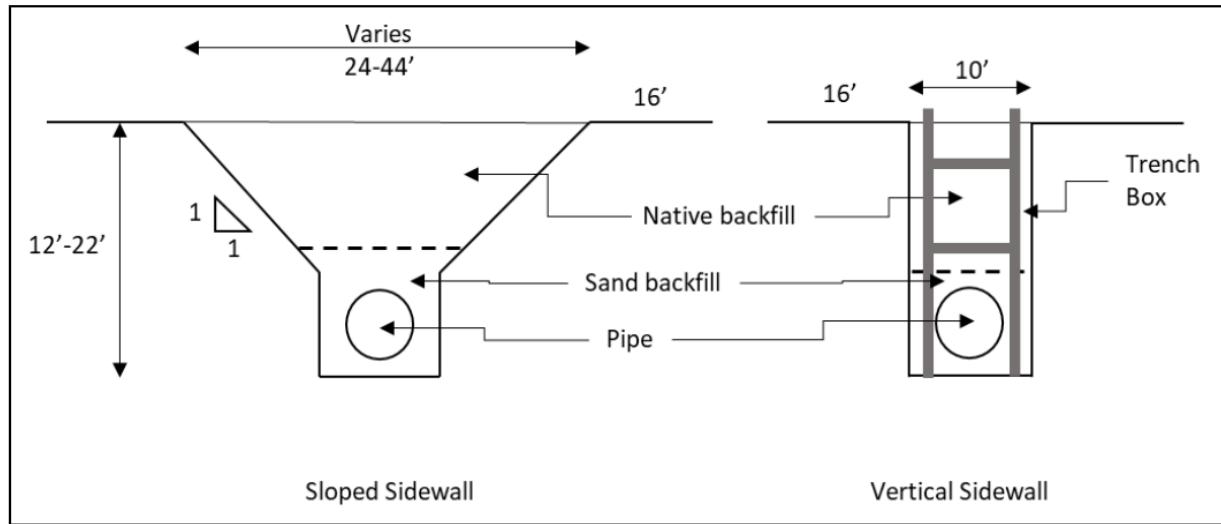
Typical excavation schematic (Stantec Inc. 2023).
